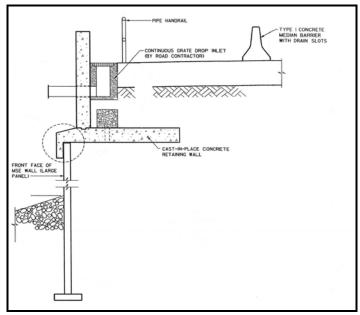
, Hybrid Wall – Cantilever Concrete over MSE Wall
